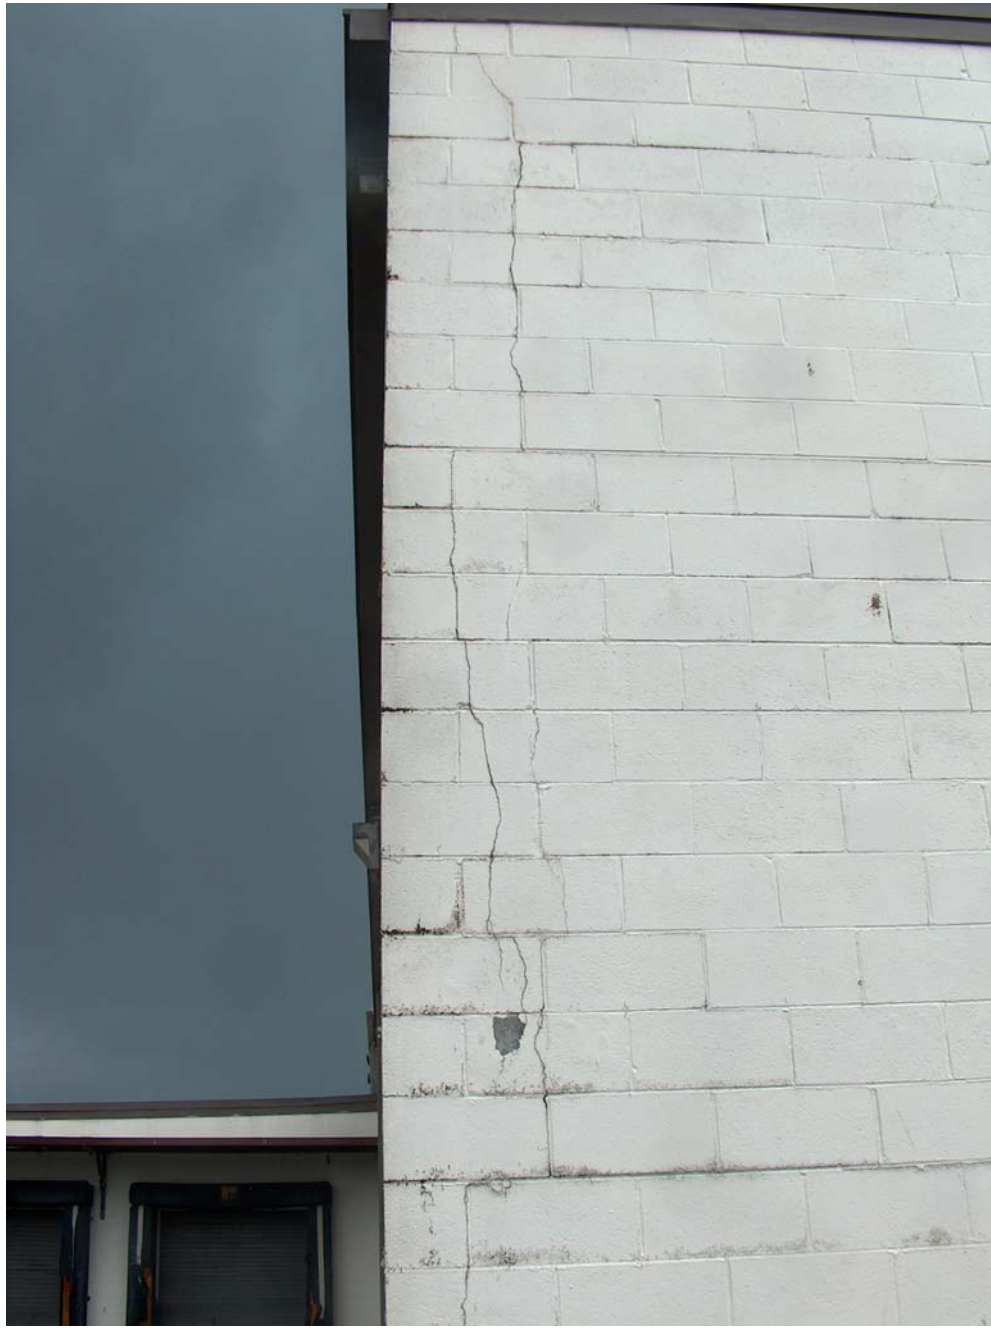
Crack at rear corner of building extends for full height of wall. We recommend replacement of cracked CMU and repointing. This is typical of several areas on the rear and side walls.
